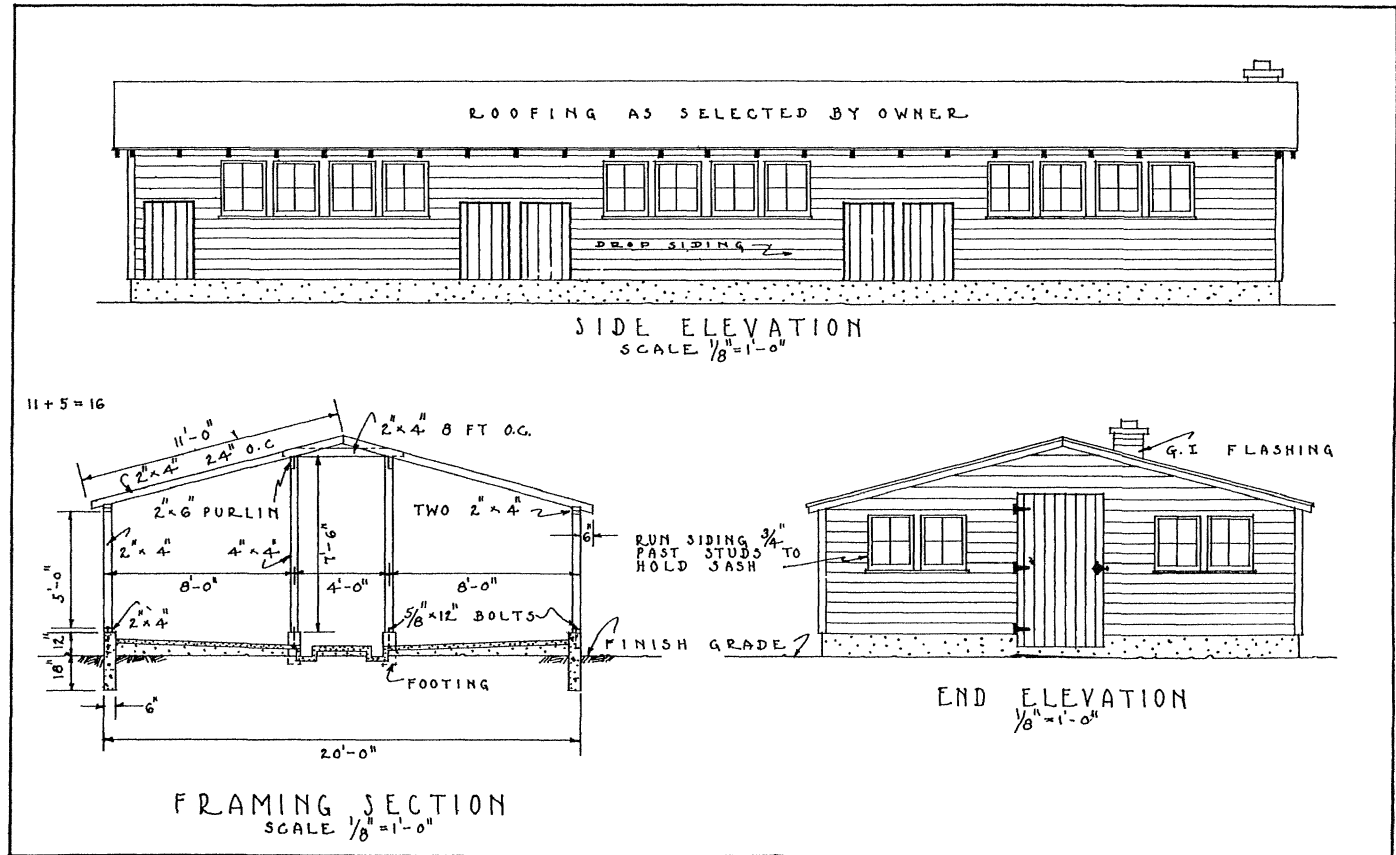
A gable roof house to run north and south. No skylight windows. To make a complete set of drawings add Figs. 2, 12, and 13.
